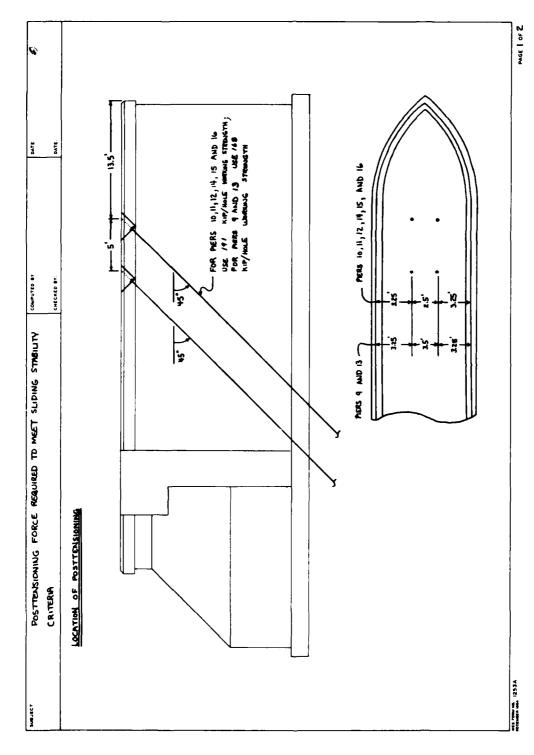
Layout of posttensioning required to meet sliding stability, Soo Dam (Continued)
